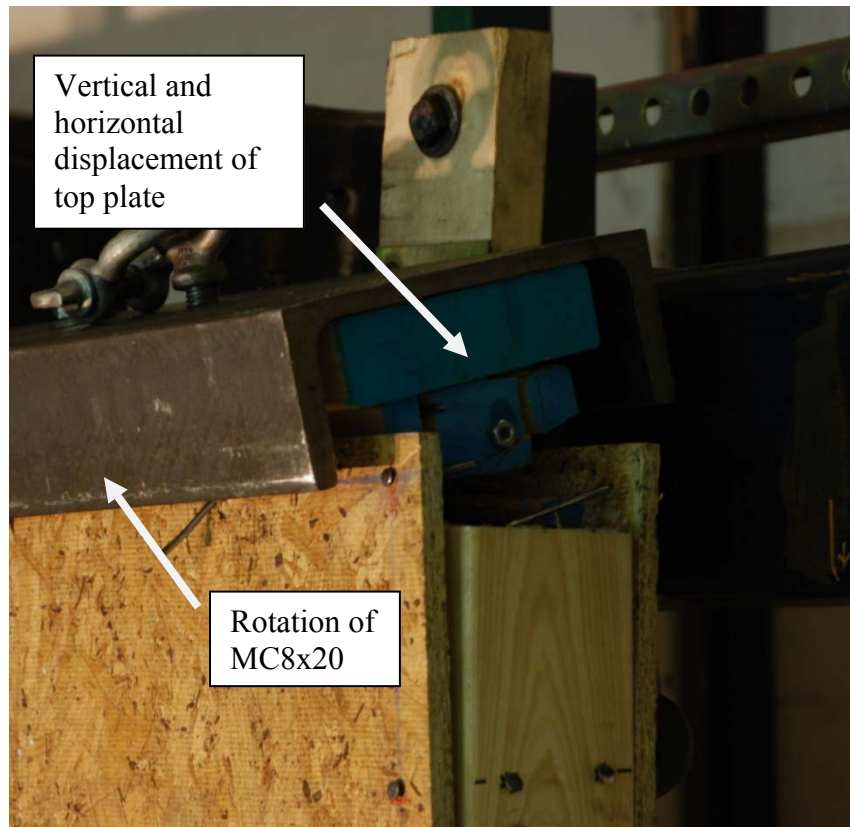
Tear-out of top plate from end posts and sheathing after Fatigue 1 of Specimen A1Bearing-3C. Displacement of MC8x20 channel which is used to apply load to specimen.
